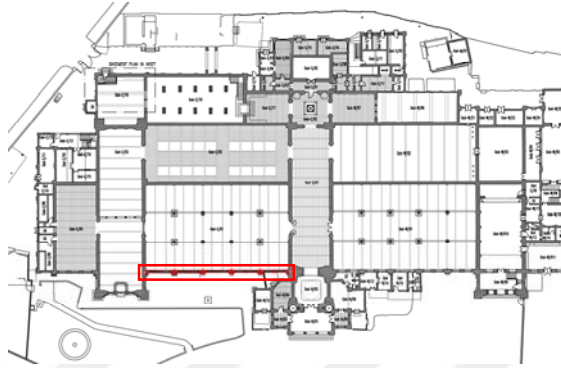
Key Plan showing wall Gnd-E/01-N-W
